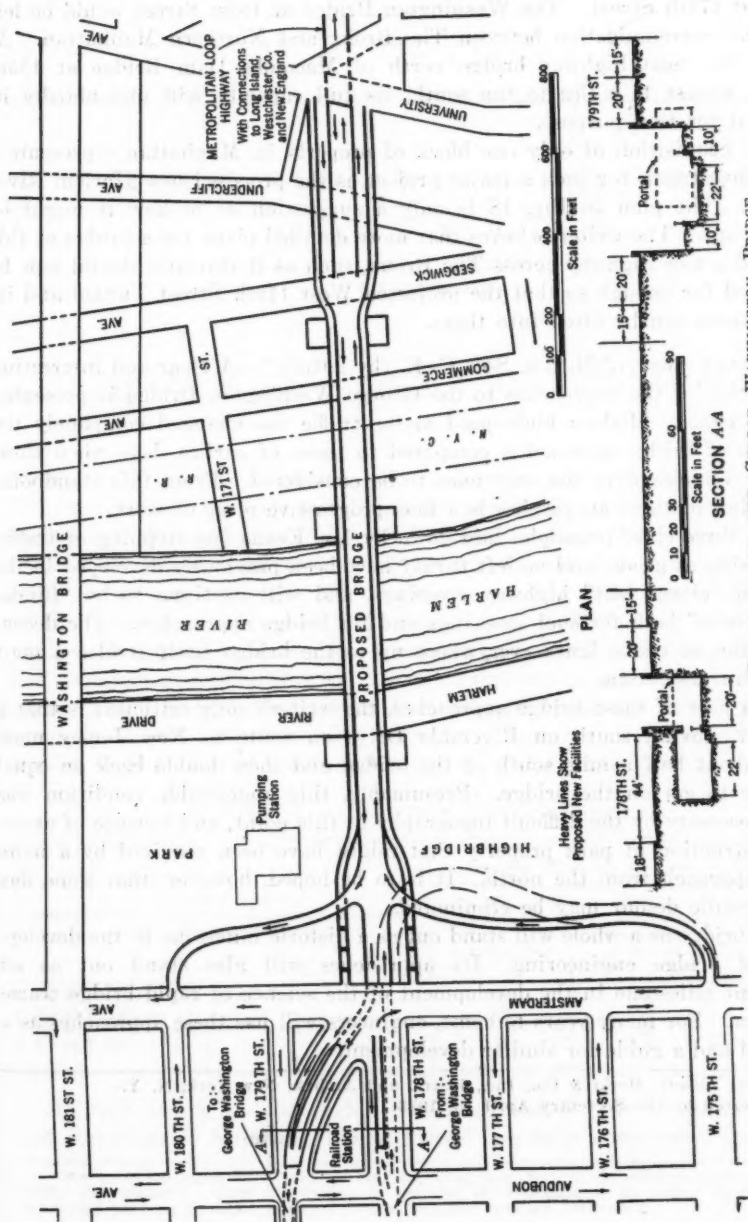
STUDY, FOR AN EASTERLY EXTENSION OF THE GEORGE WASHINGTON BRIDGE, APPROACHES AS PART OF A METROPOLITAN LOOP HIGHWAY.
